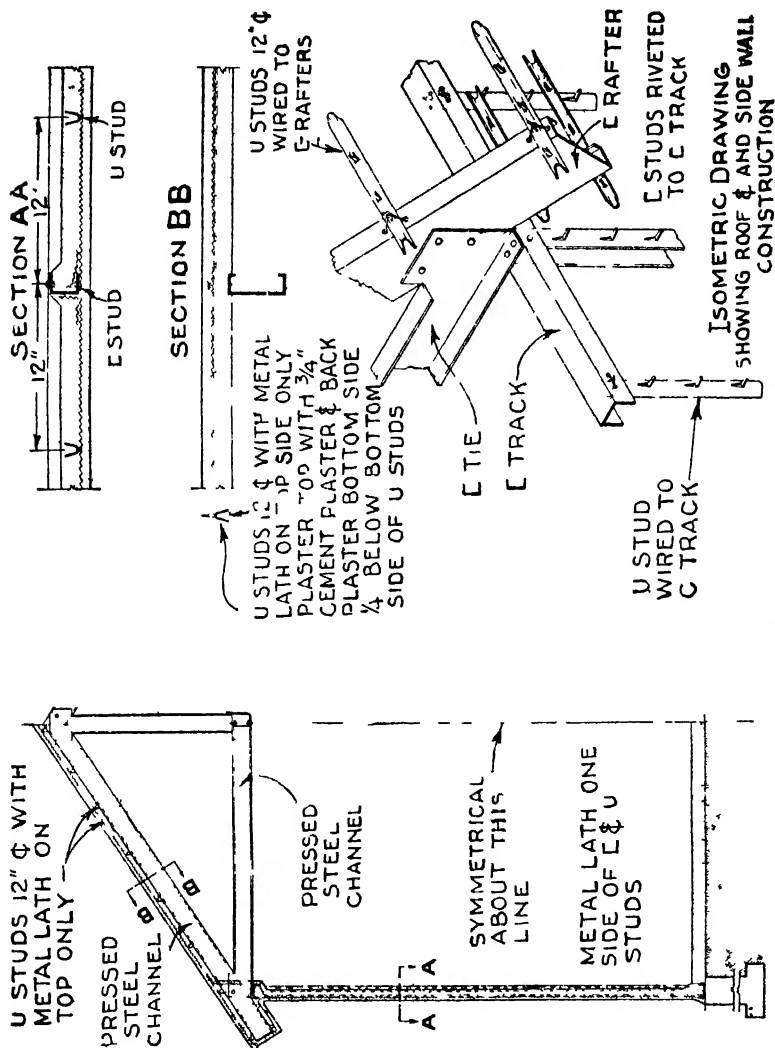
,745 —Standard sawtooth with vertical or inclined face; fireproof roof construction, upper end
